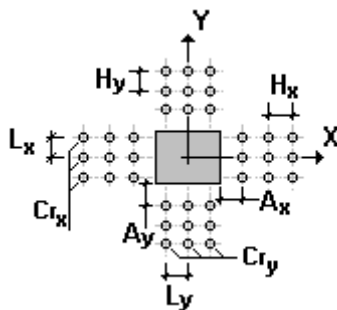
Cross-shaped arrangement of reinforcement
